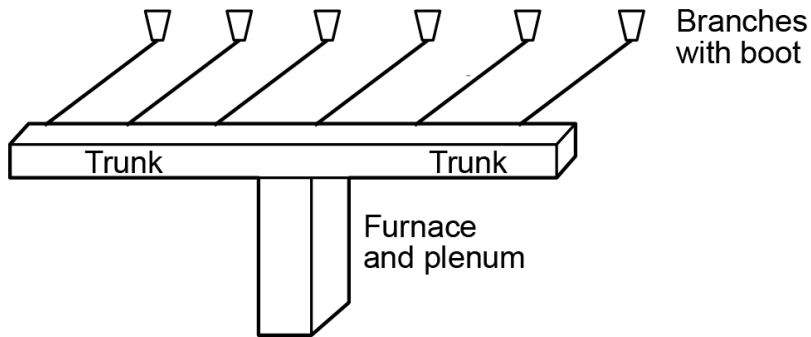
Trunk and branch (two-way system). (Skilled Trades BC, 2021) Used with permission.
